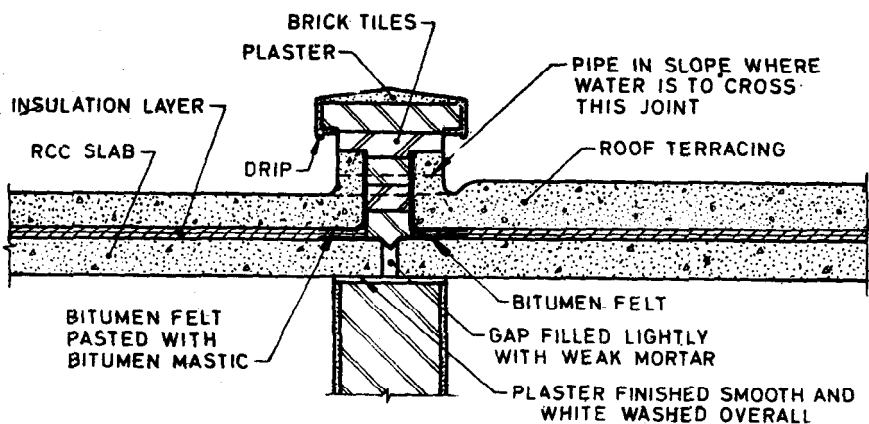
TYPICAL DETAILS OF PARAPET JOINT IN ROOF TERRACING WITH OR WITHOUT WALL
